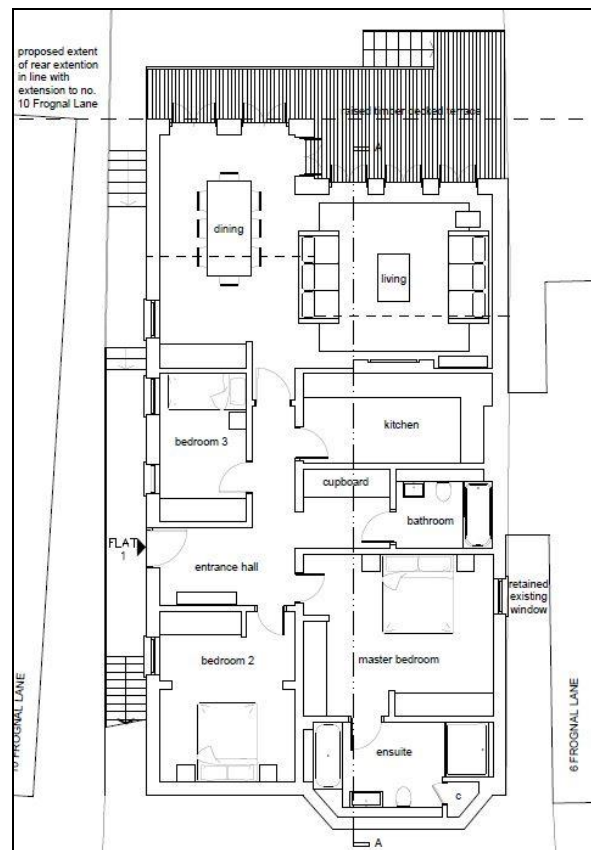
Extract from drawing 7395/ 101B Proposed Plan
